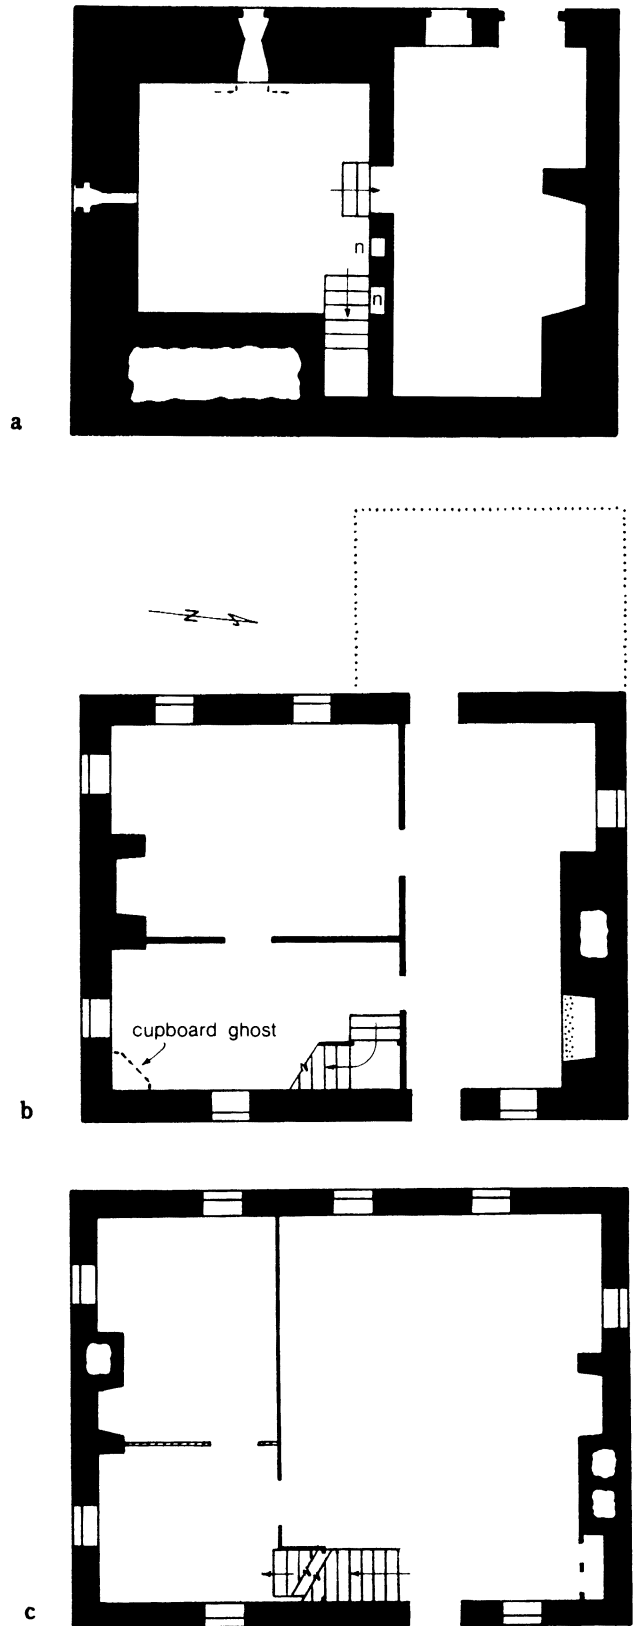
Fort Stover. Cellar, first-, and second-floor plans. From 1940 Historic American Buildings Survey plans.
